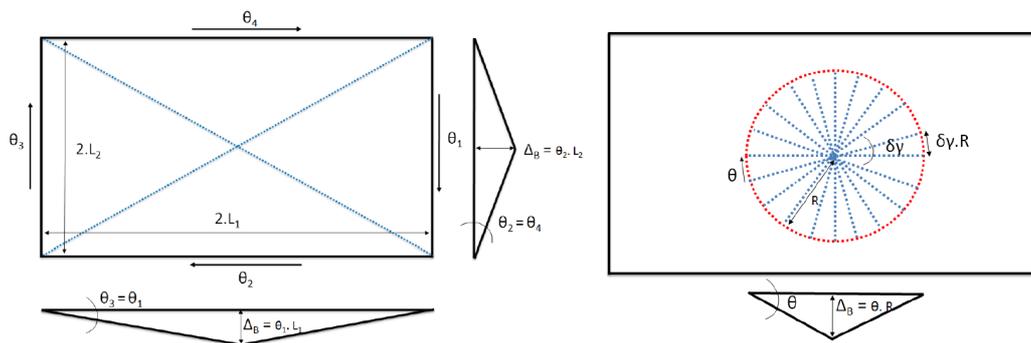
Examples of failure mechanisms for an internal column loss (Lemaire 2010)
